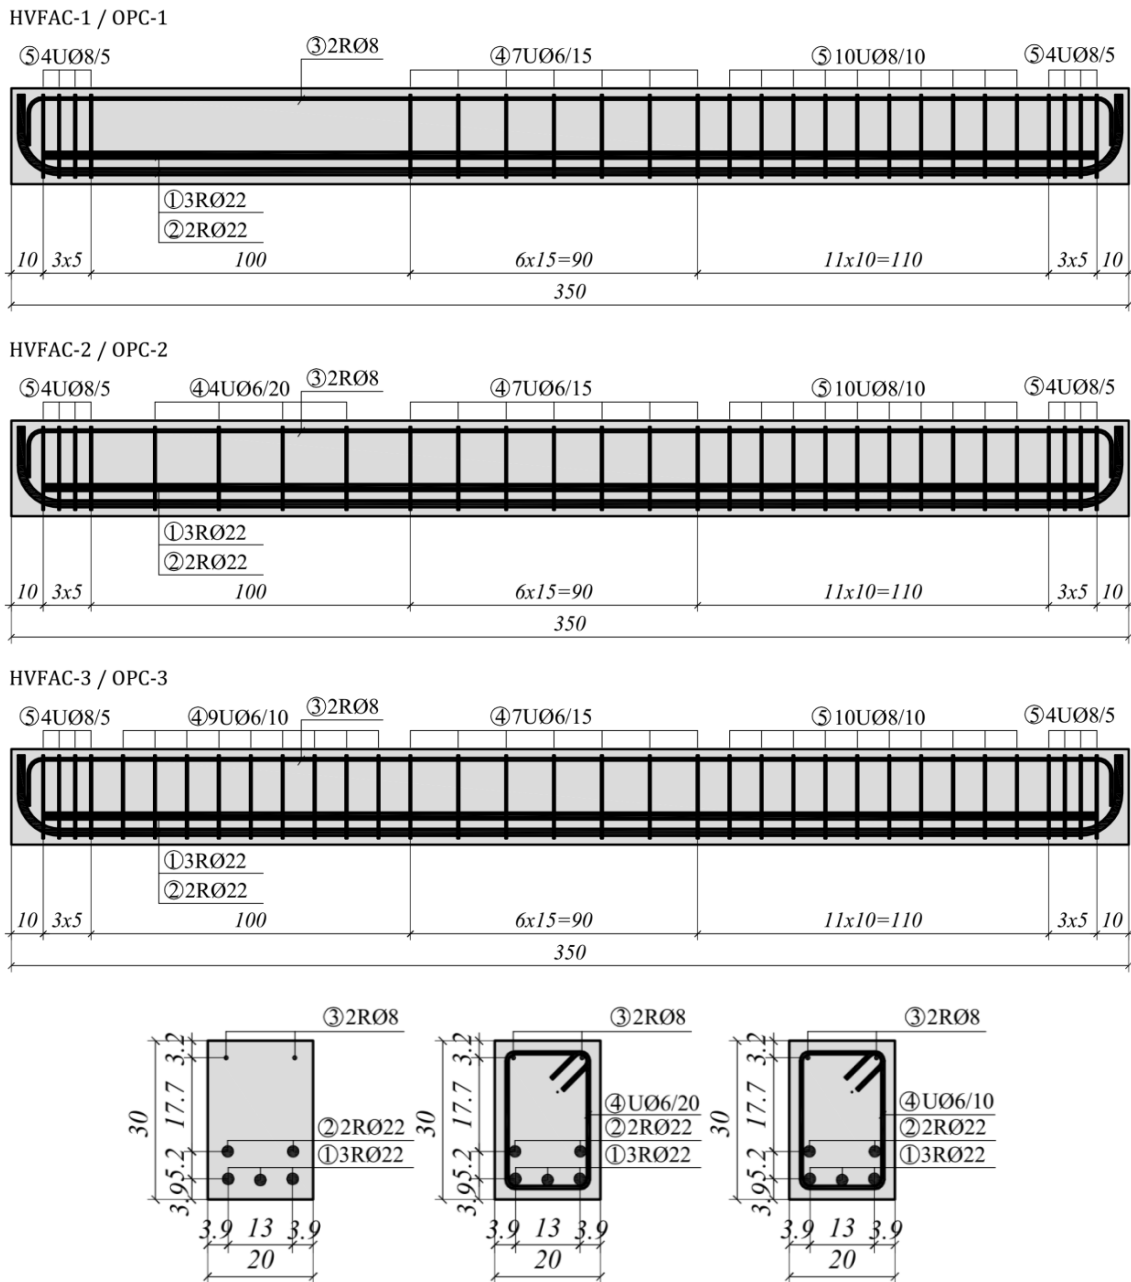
Reinforcement layout of beams tested in shear failure
